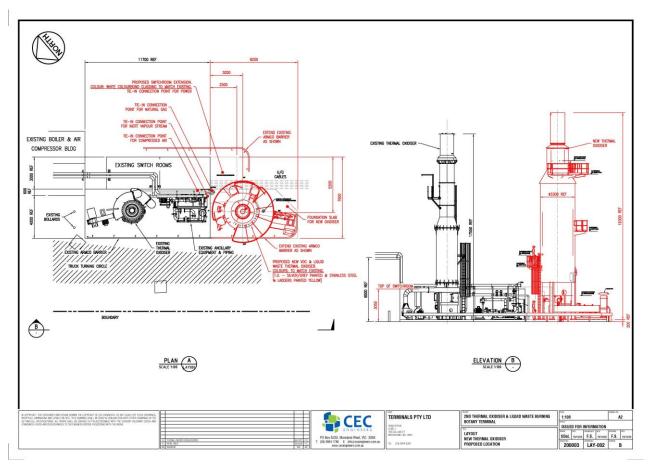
Layout Plan and Elevation of the New Thermal Oxidiser (Group 6 Treatment Plant)
